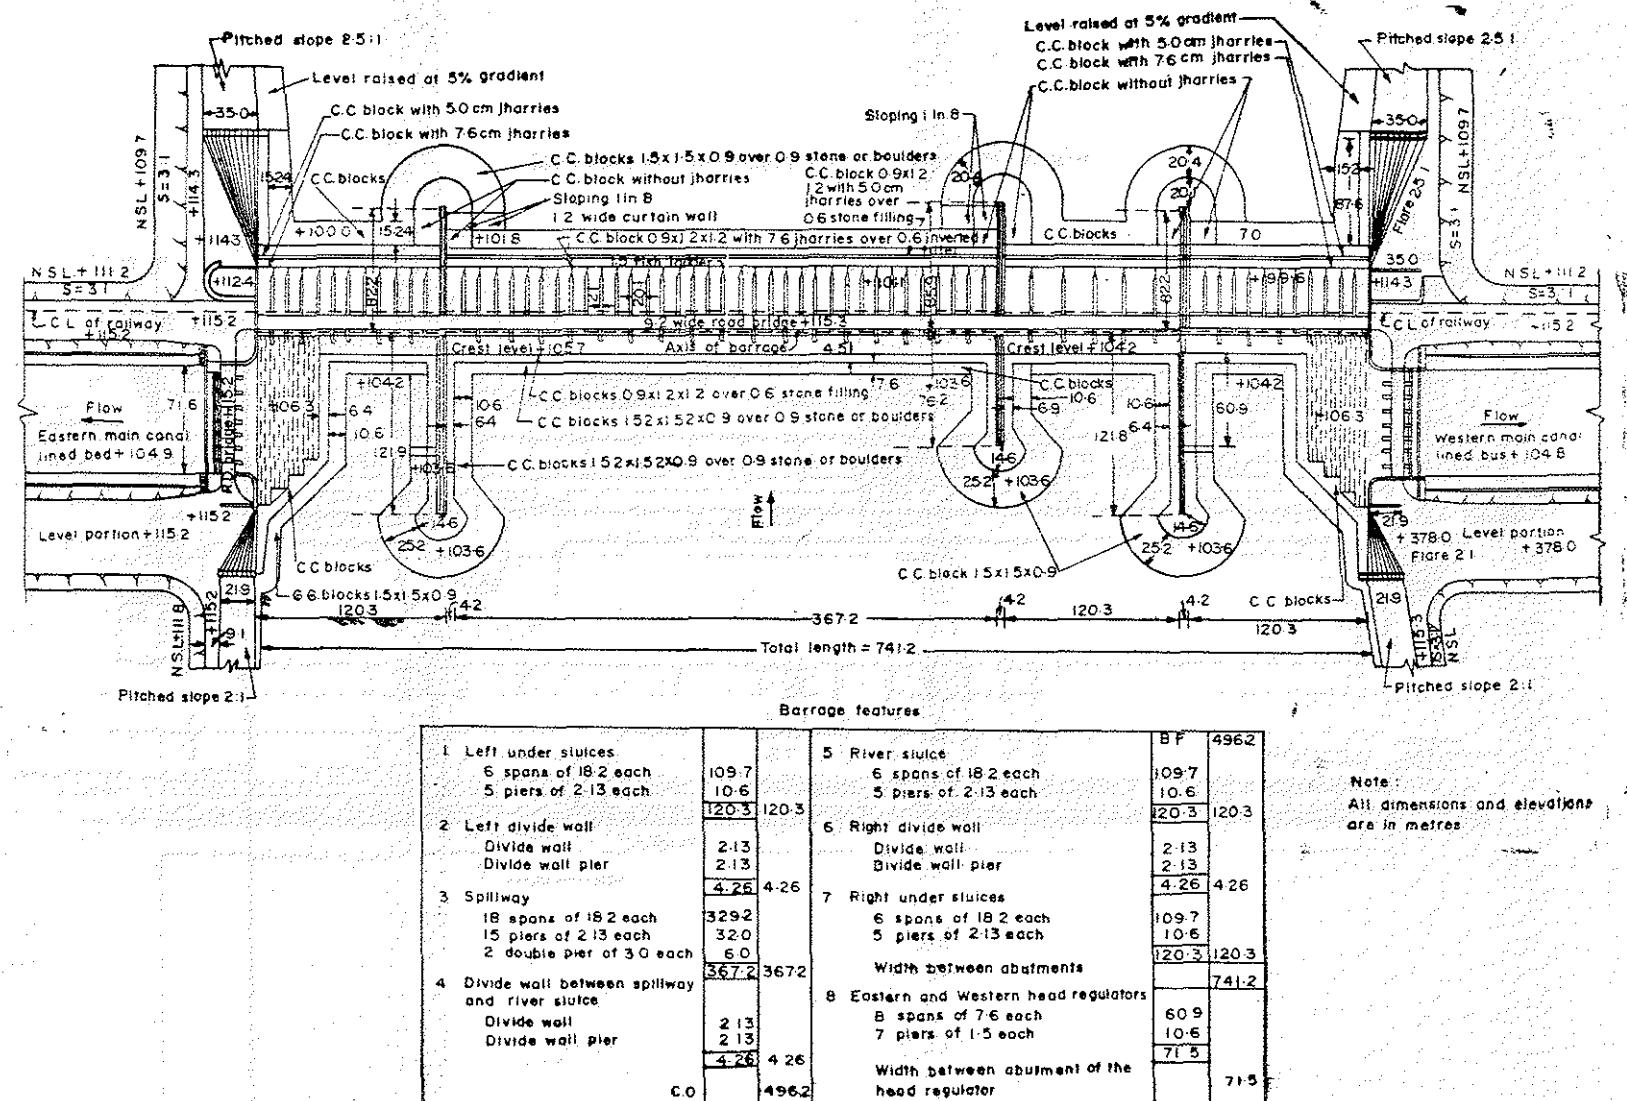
Gandak Barrage detailed layout plan.
